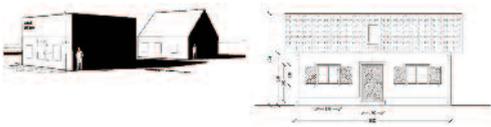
Typical building 1; its geometries and the medium sample building.
